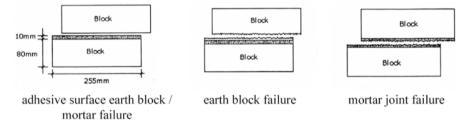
Earth bock masonry under shear stress: possible failure patterns [63]
